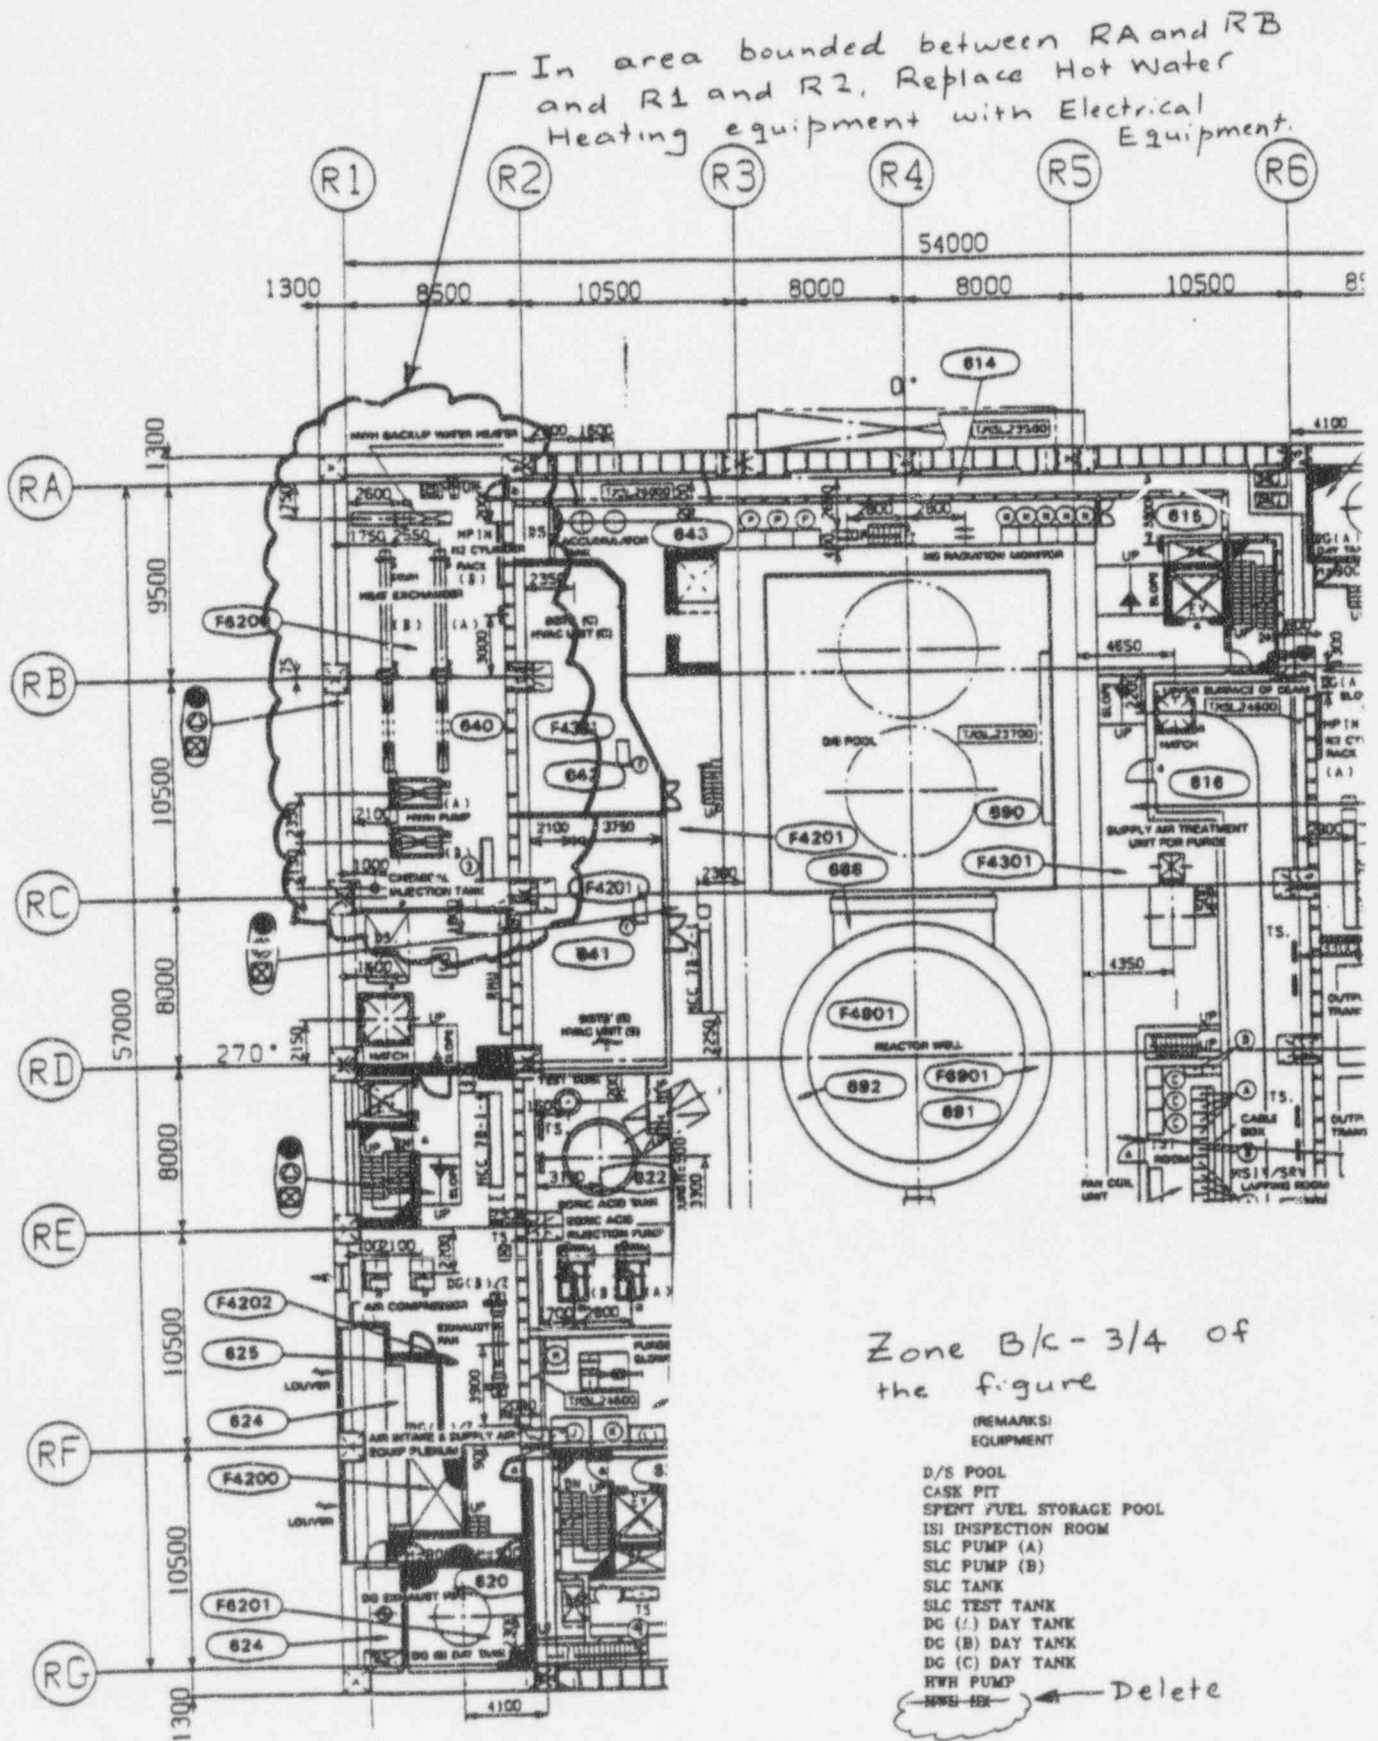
REACTOR BUILDING, ARRANGEMENT PLAN AT ELEVATION 23500mm
